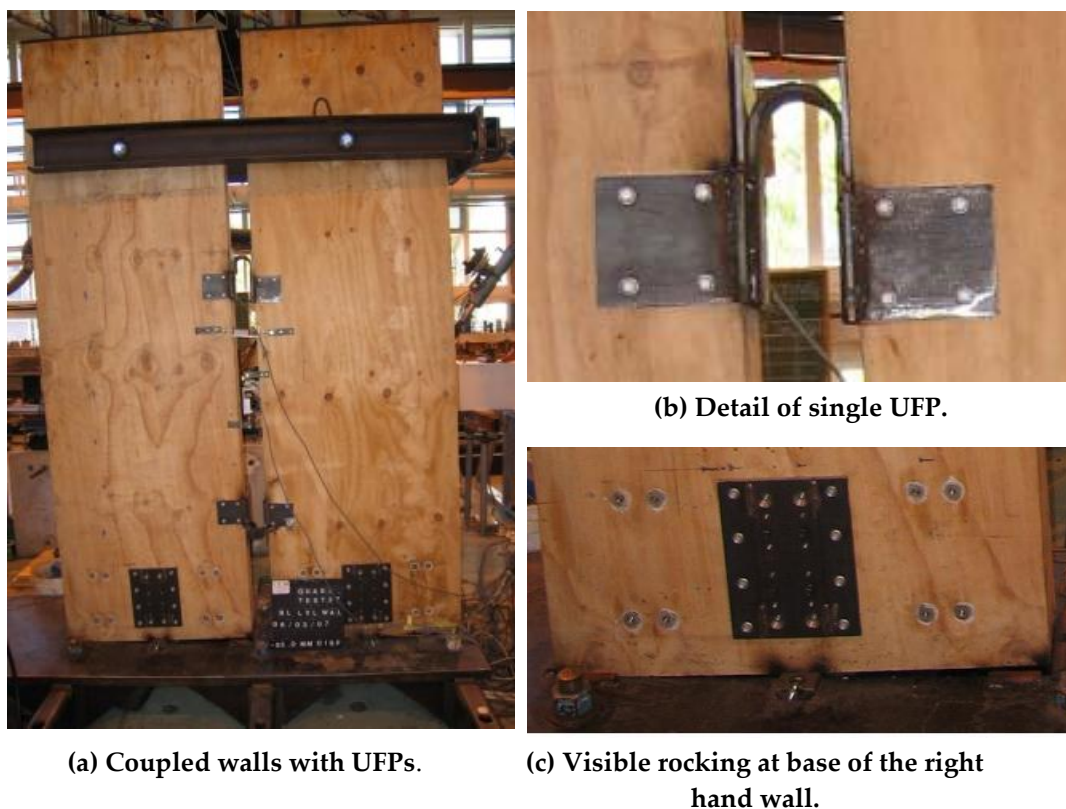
Test set-up and coupled wall specimen (Ibqal et al., 2007).
